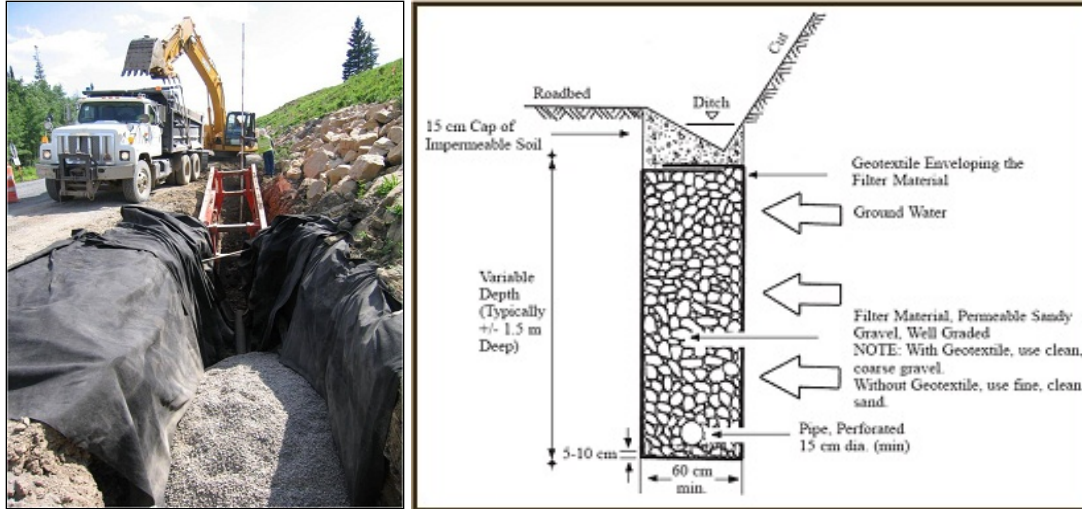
SUBSURFACE DRAINAGE. PHOTO AND DRAWING PROVIDED BY G. KELLER.
